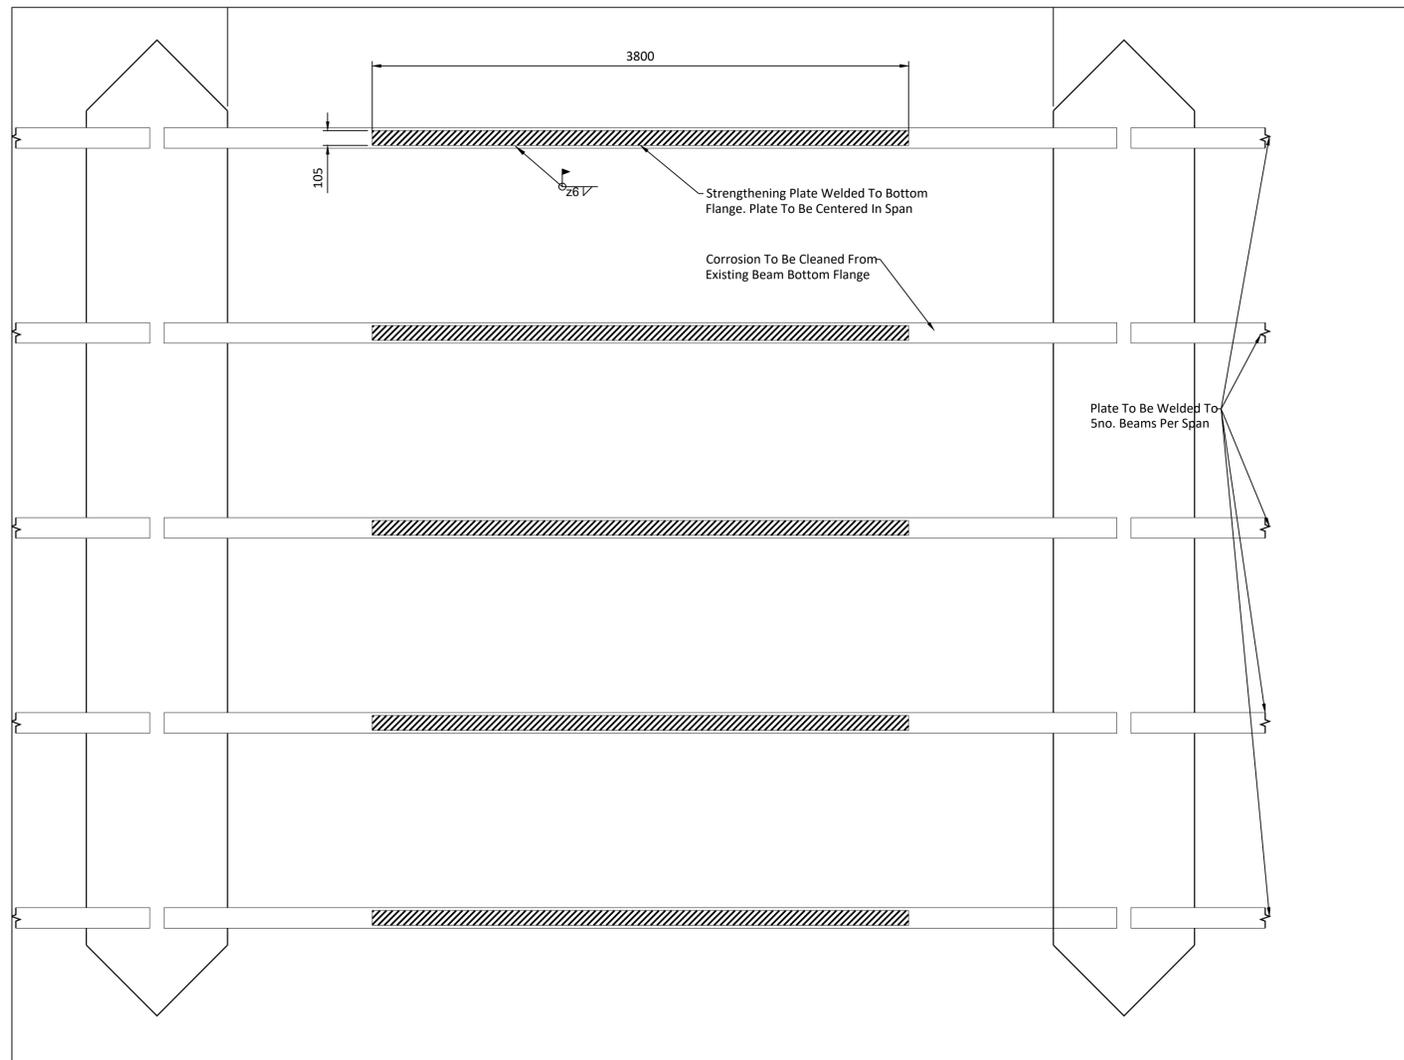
BRIDGE SOFFIT - @ SUPPORT
